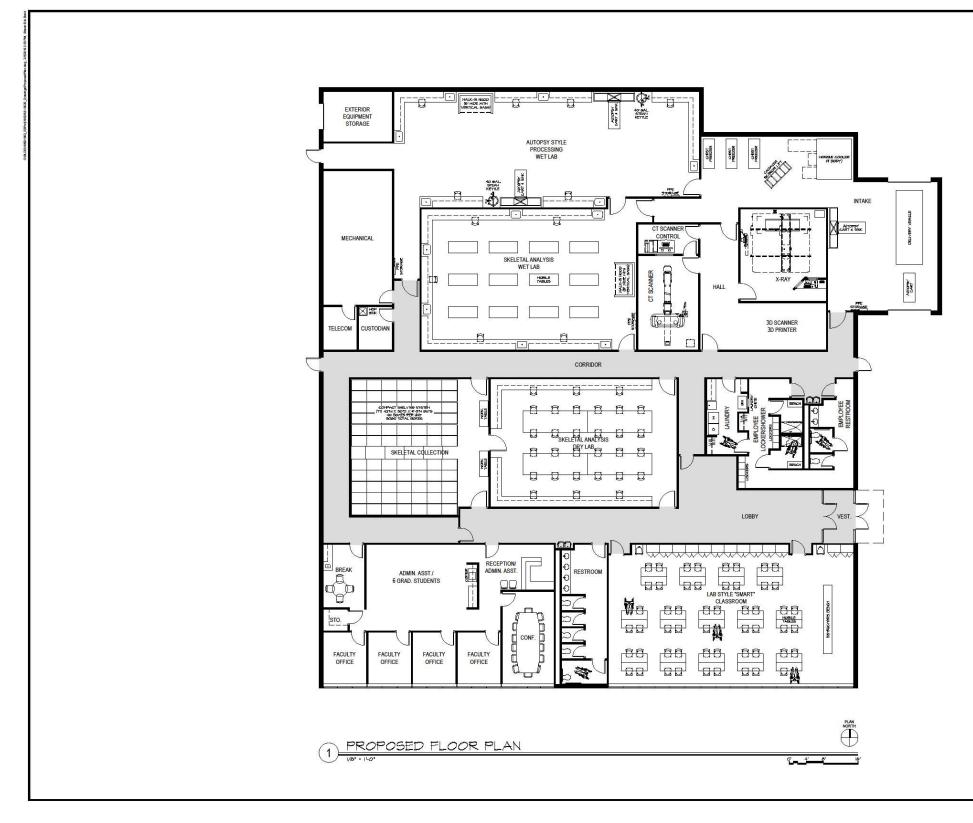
Proposed new construction laboratory, classroom, and storage space (Design by Shawn Bond, SIU PSO)
